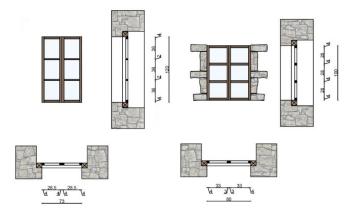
Beqiri, A. (2024) Lluke Zanati House Window Detail
